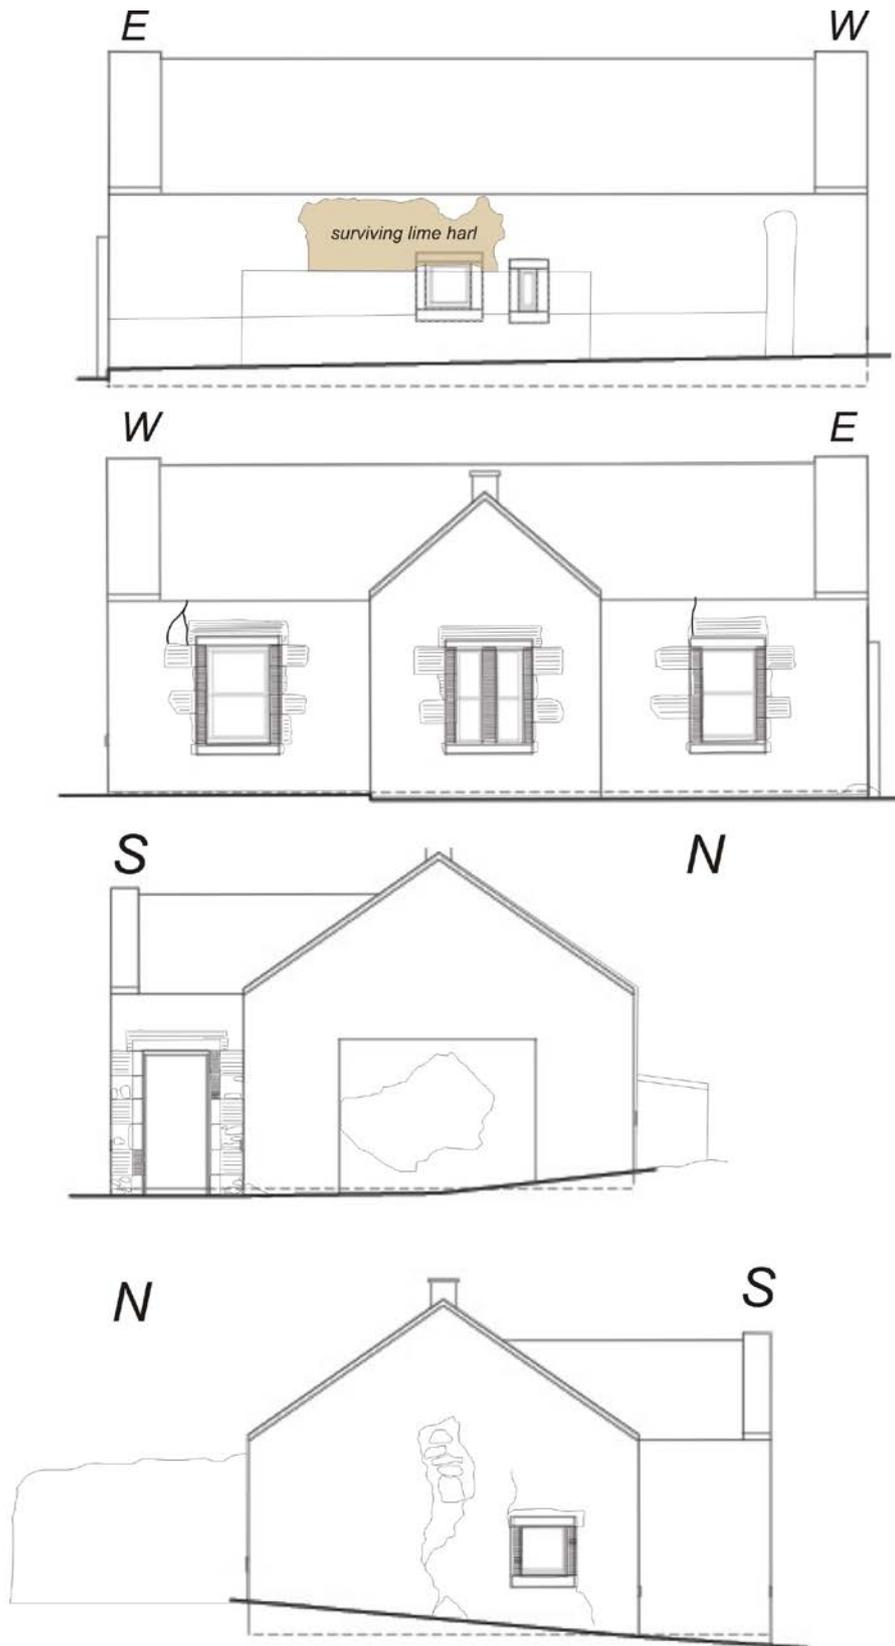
External elevations surveyed at 1:50 reproduced at 1:100
